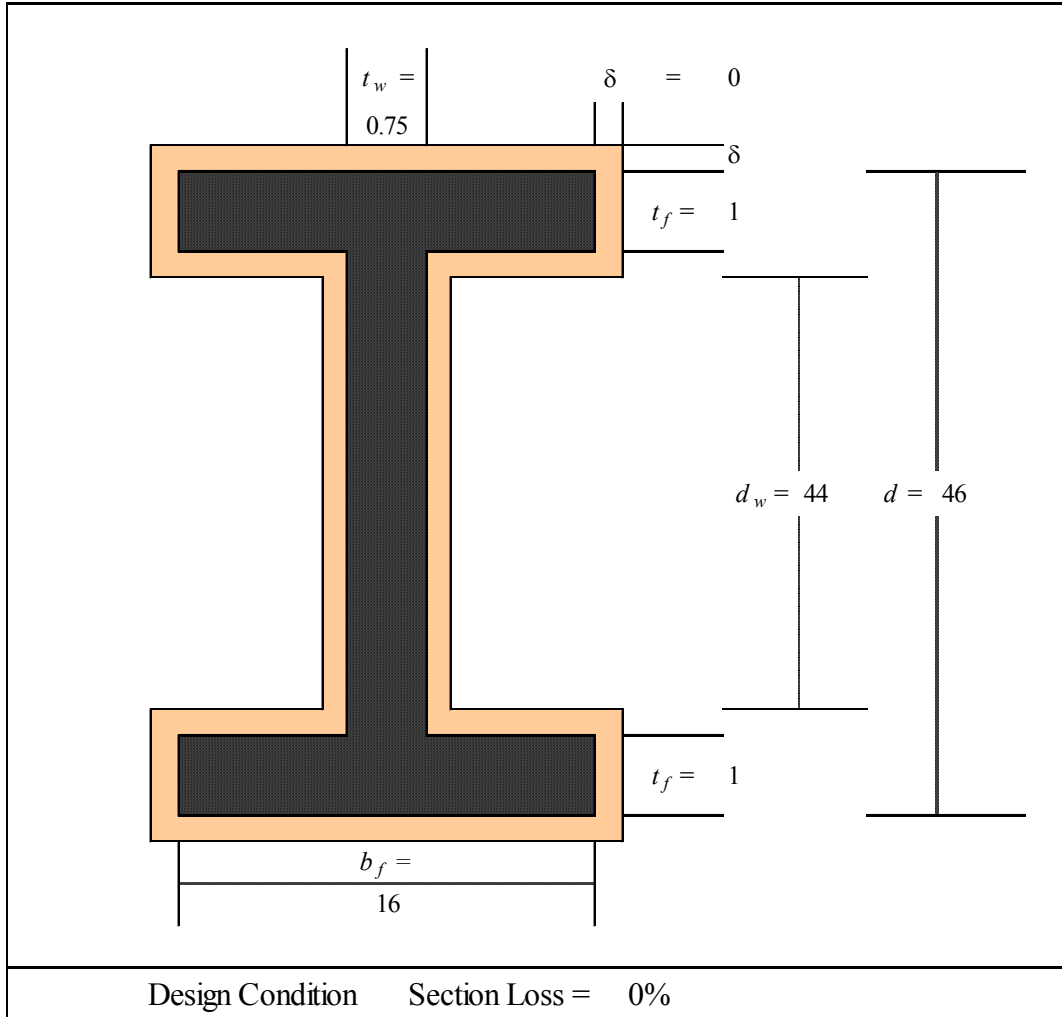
Dimensions of Steel Girder Cross-Section with No Section Loss
